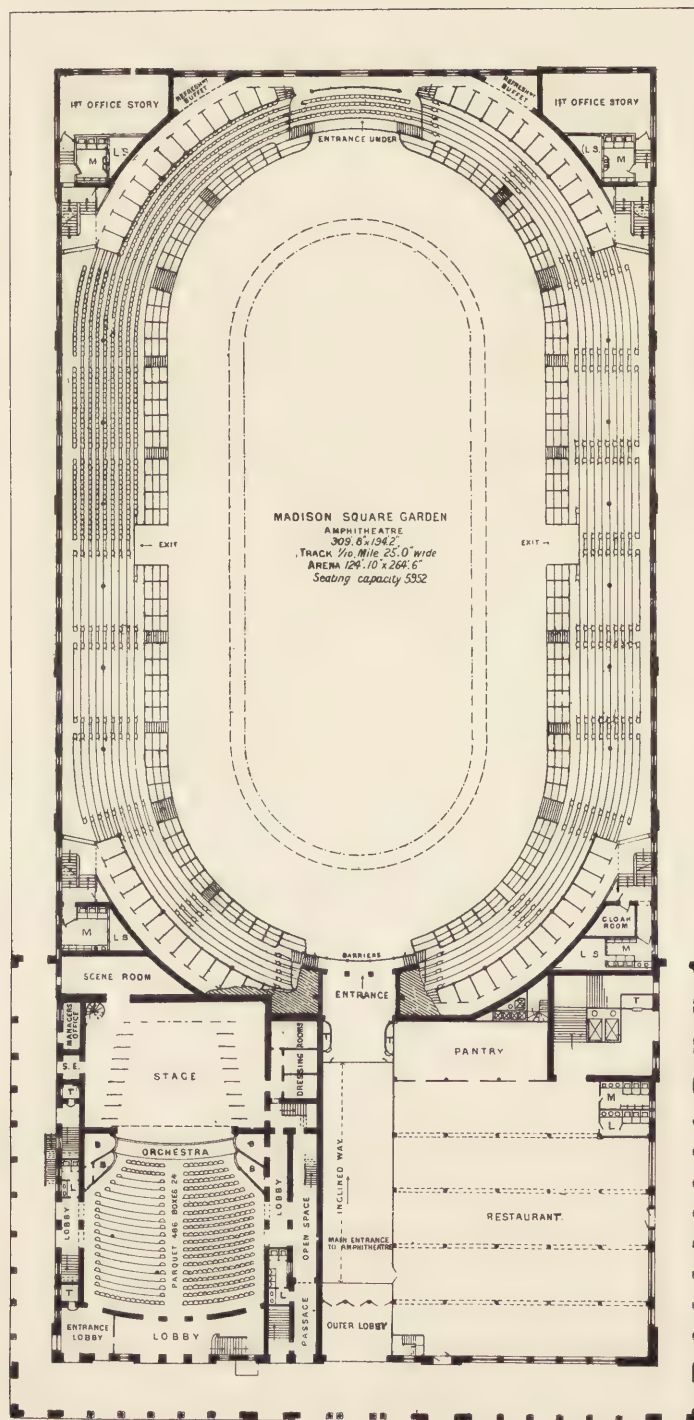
MADISON SQUARE GARDEN BLOCK: PLAN AT PAVEMENT LEVEL.
